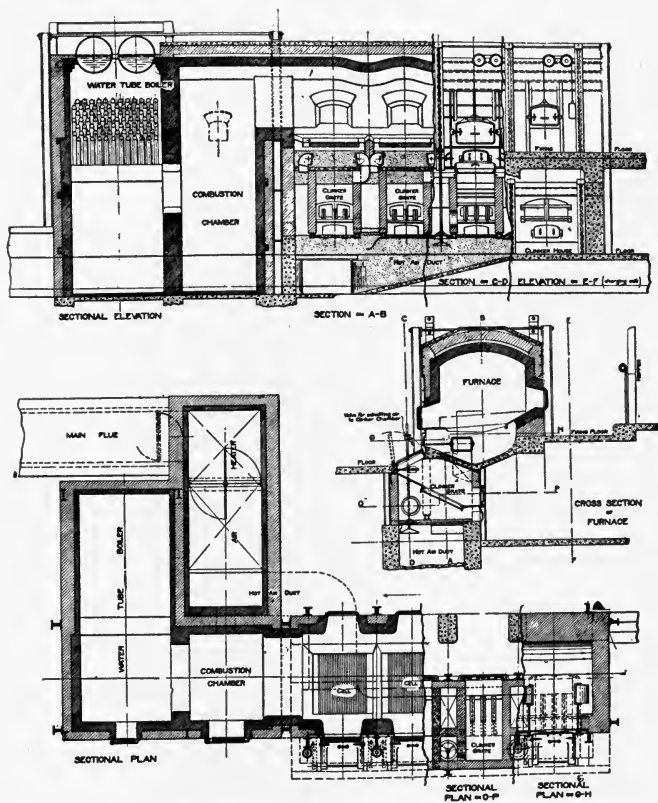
THE HEENAN & FROUDE CONTINUOUS GRATE DESTROYER. (PLAN AND SECTIONS.)
